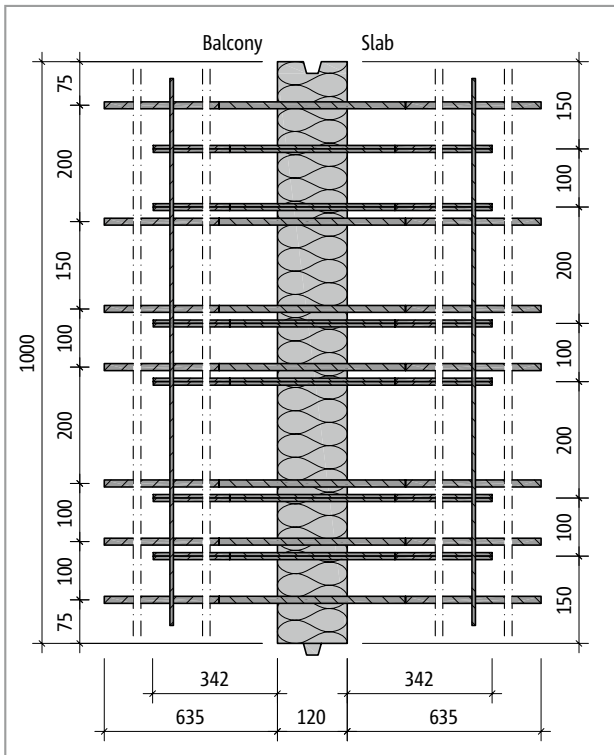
Schöck Isokorb® XT type D-MM3-VV1: Plan view
